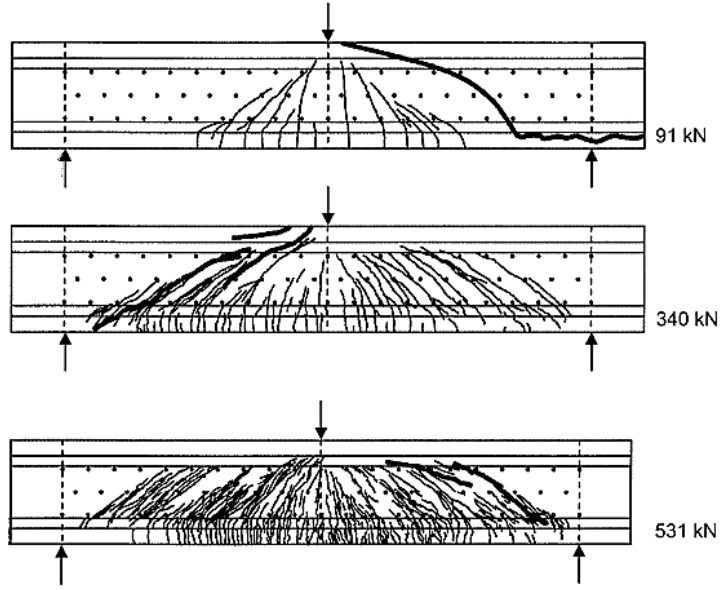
Crack patterns of UHPFRC beams with fiber reinforcement (Sato et al., 2008)
